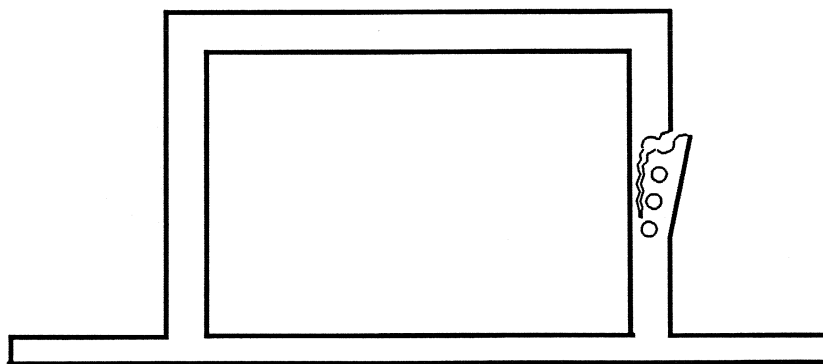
Delamination at Stirrup #6 of Web DC
